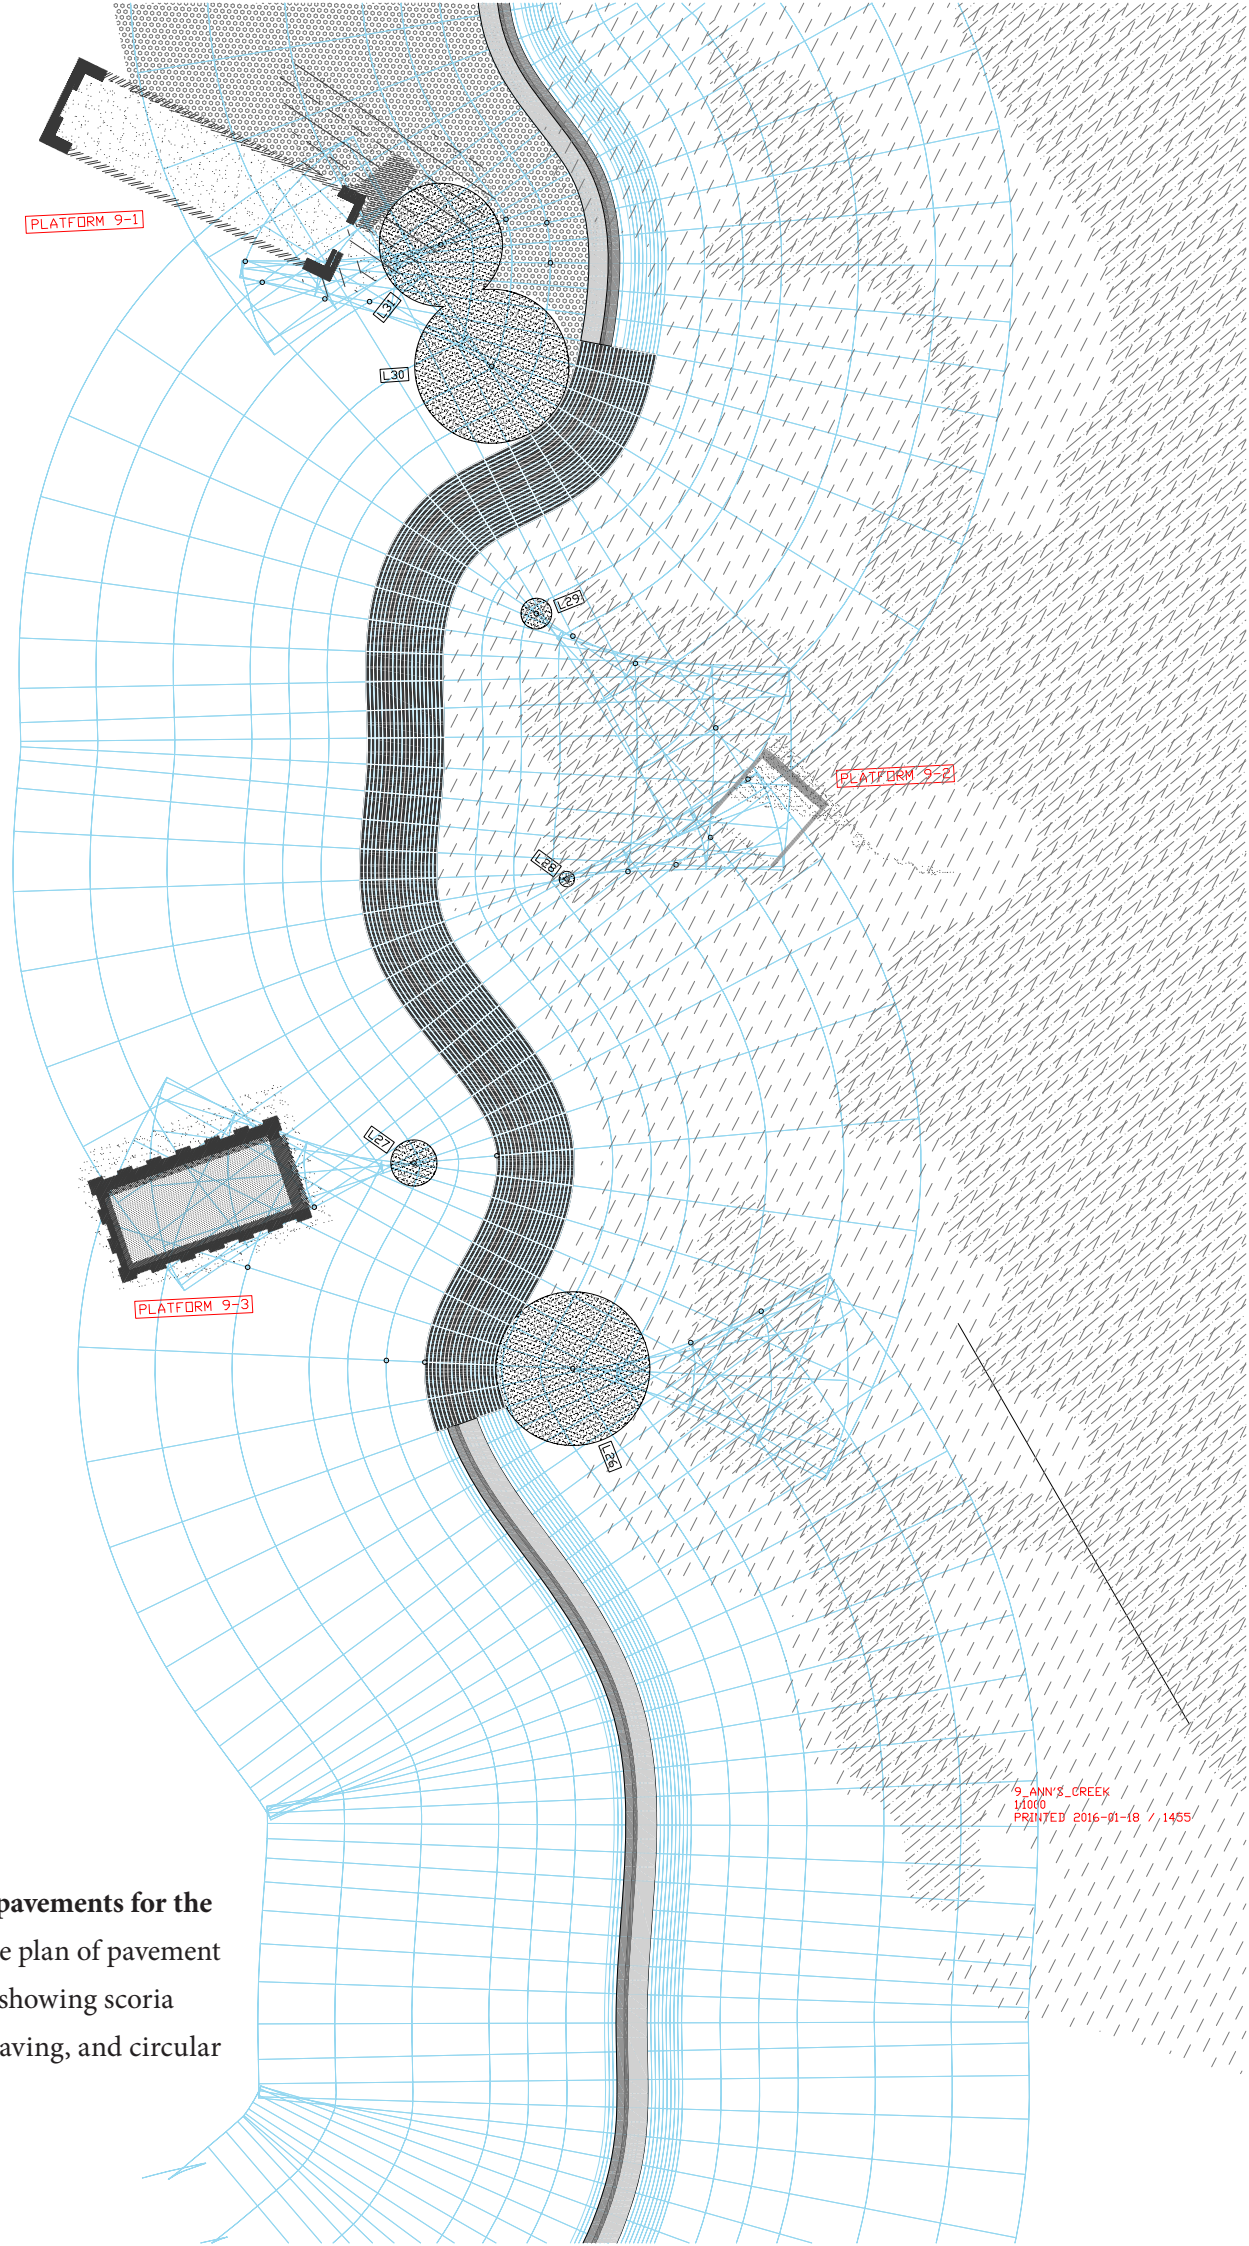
Path and pavements for the Māngere Inlet. Site plan of pavement near Ann's Creek, showing scoria platforms, basalt paving, and circular lawns.
